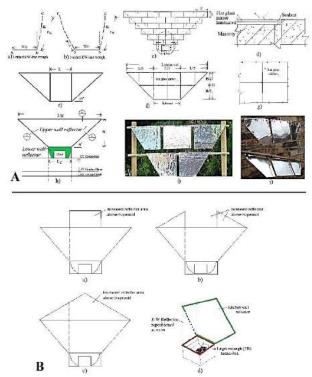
TRW Kitchen Wall Trapezoidal Reflector Studies: A a-b) diagrams of one-sided and two-sided nonimaging reflector wall troughs; c) elevation of trapezoid reflector wall with flat mirror rectangular tiles; d) detail of flush laminated flat glass mirror tile in masonry relief; e) wall with aluminum reflector trapezoid; f-g) wall with large flat glass mirror tiles and masonry
